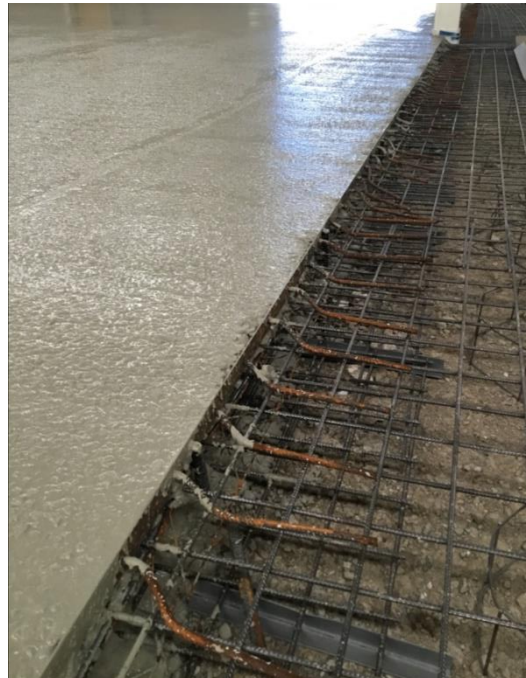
Formed joint for a hybrid reinforced concrete floor.
